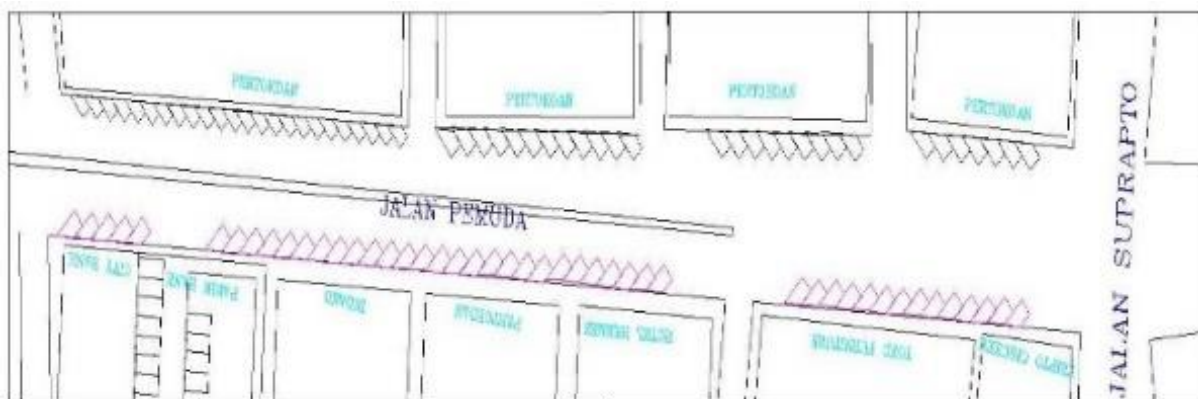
Alternative parking arrangement 1 Section A corner 45°
